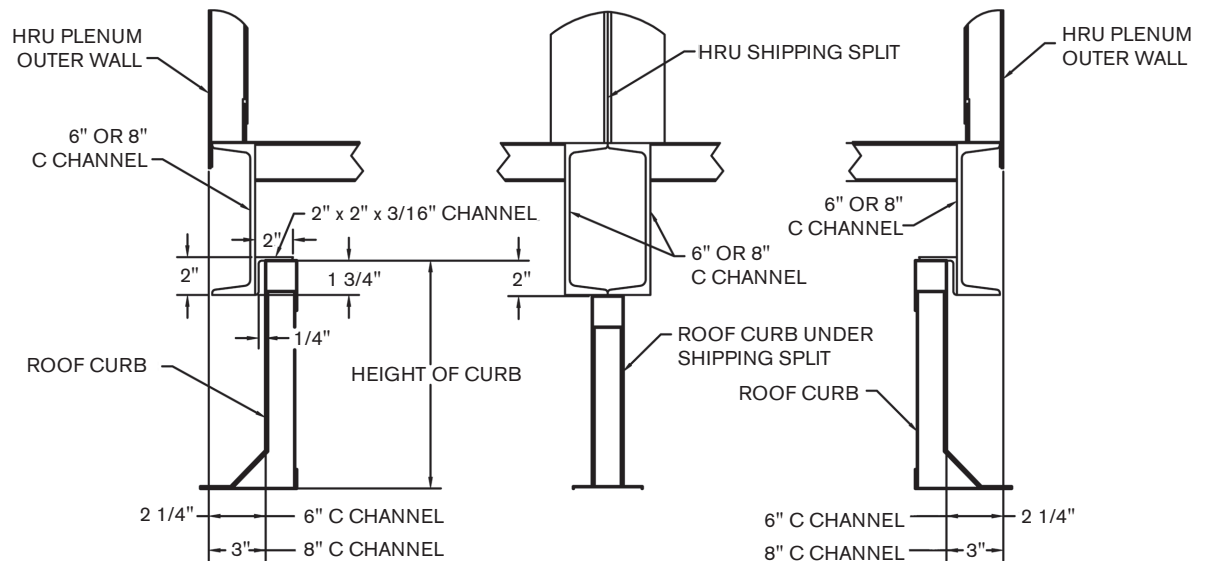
HRU Plenum with Shipping Split On Roof Curb
